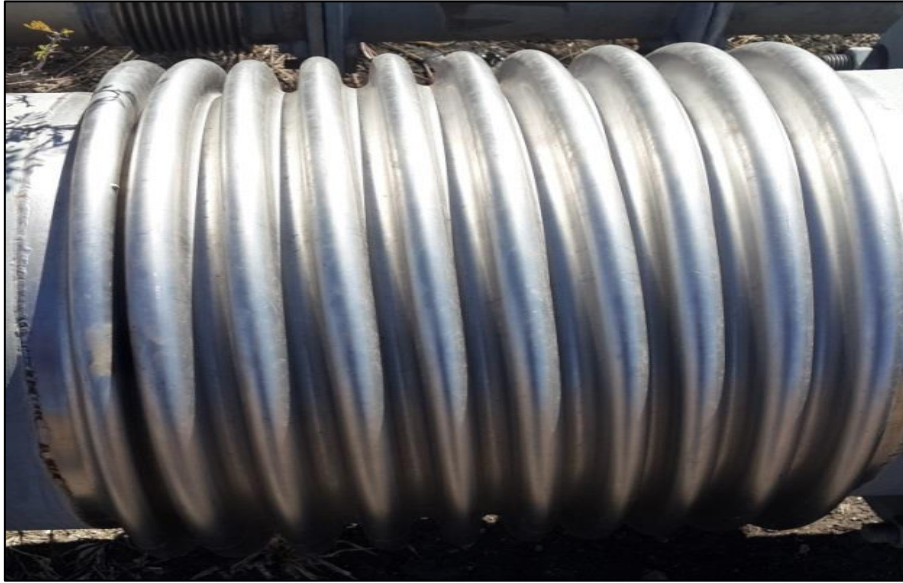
New expansion joint installed on the compressed air pipe network of Case Study 1
